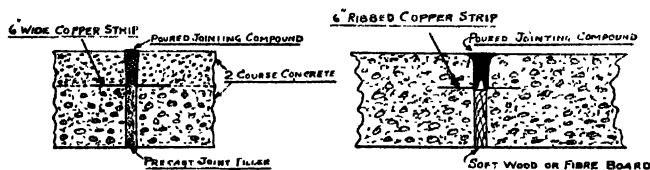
TYPICAL WATER-PROOF EXPANSION JOINTS
